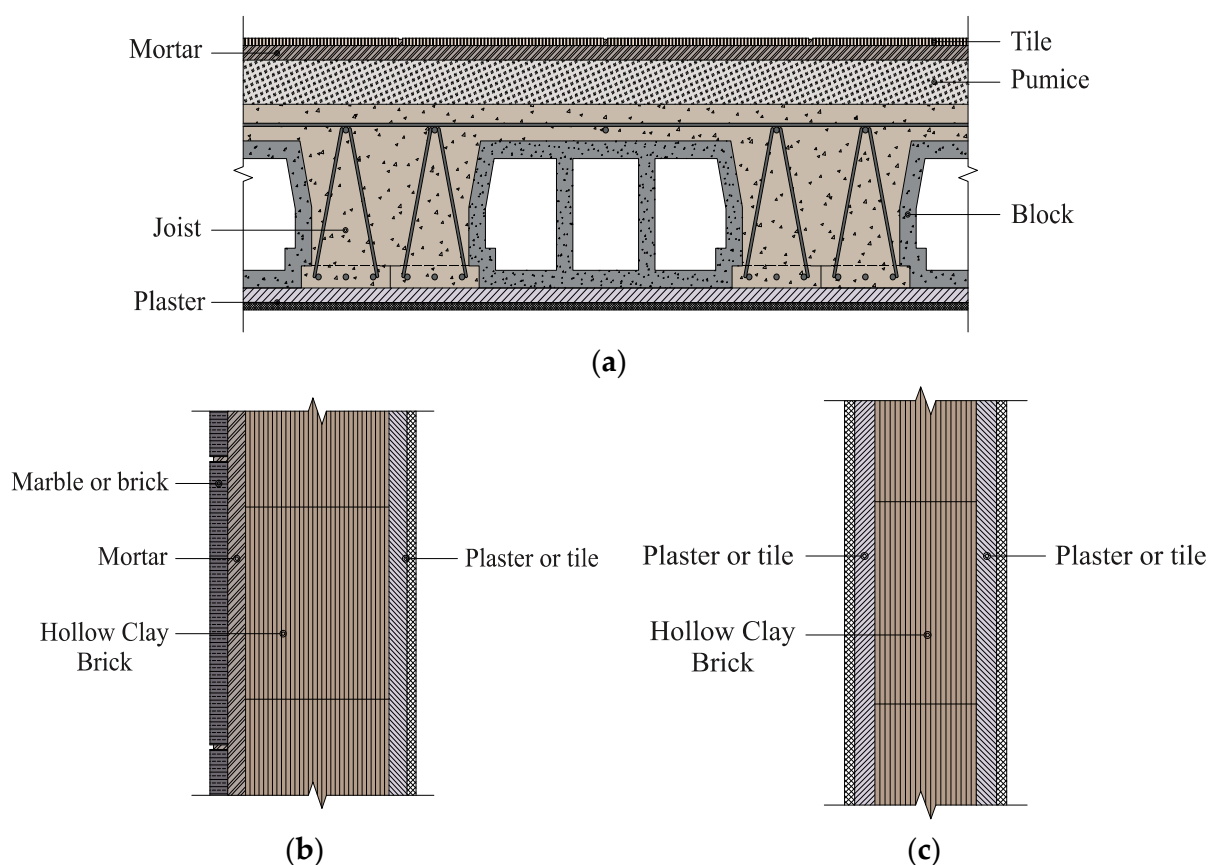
Cross-section details of the structural elements; (a) floor system by using concrete block, (b) external and (c) internal walls for the building with common materials.
